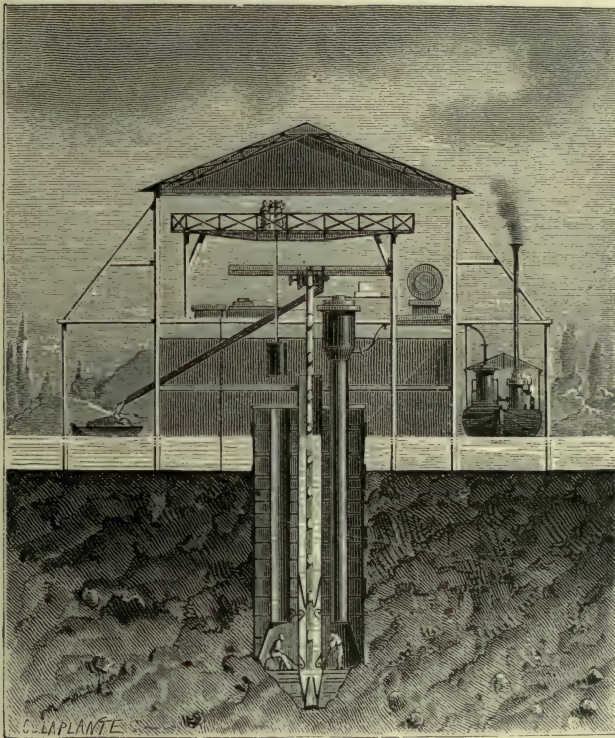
Foundation of the piers of the bridge of Kehl by the use of compressed air.
